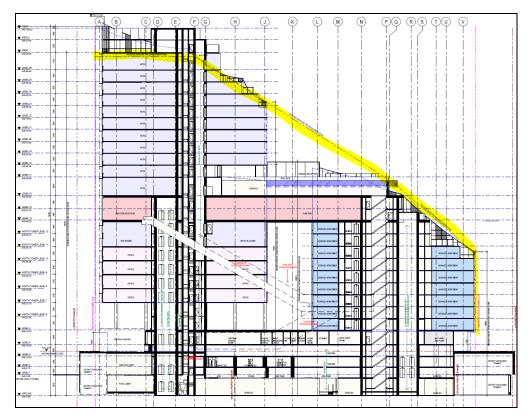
Section of development highlighting the Development Plan Addendum approved envelope
